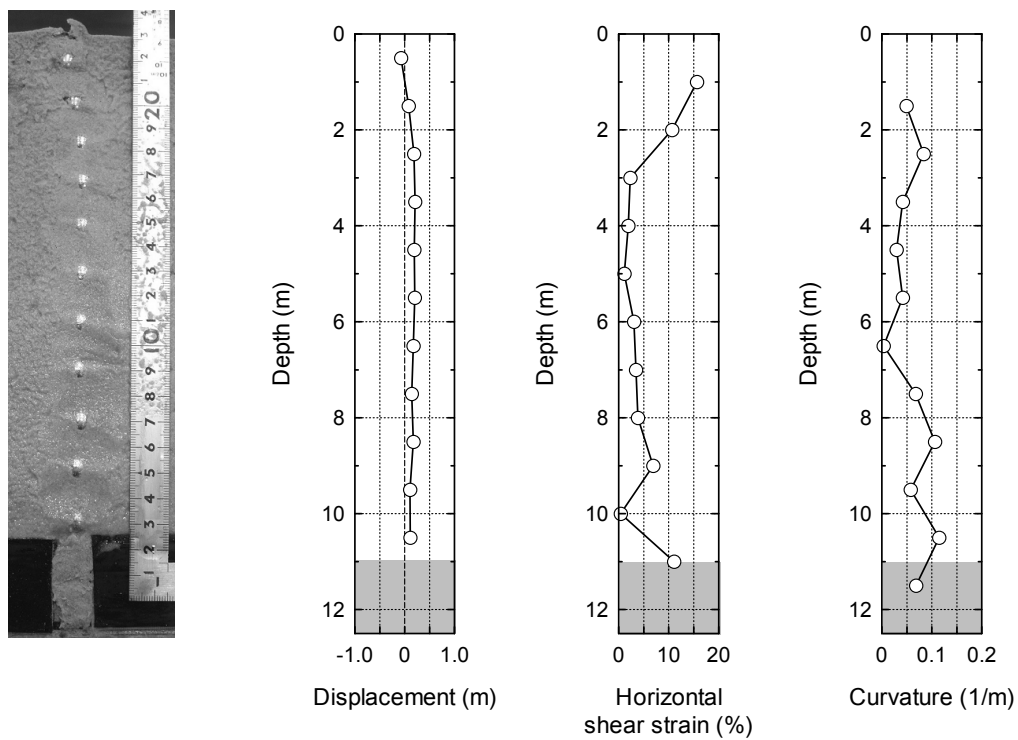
Horizontal deformation of SBM cutoff wall in Case-8.
